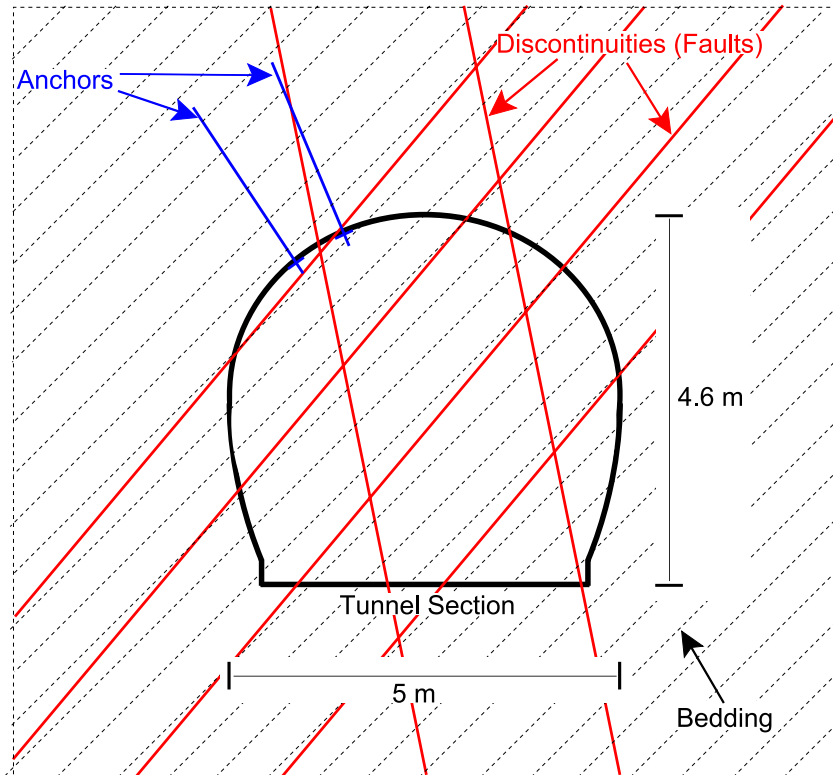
Schematic diagram of typical excavation face of the Starter niche. Bedding planes and discontinuities intersect in the face of the excavation resulting in instability in the upper left corner.
